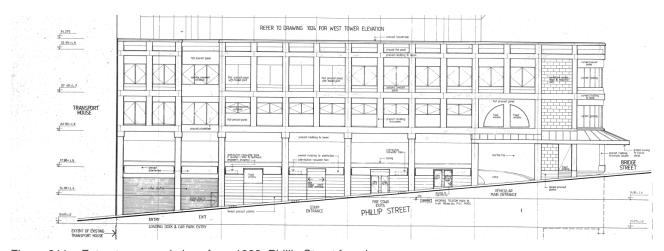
Extract proposed plans from 1983: Phillip Street facade
